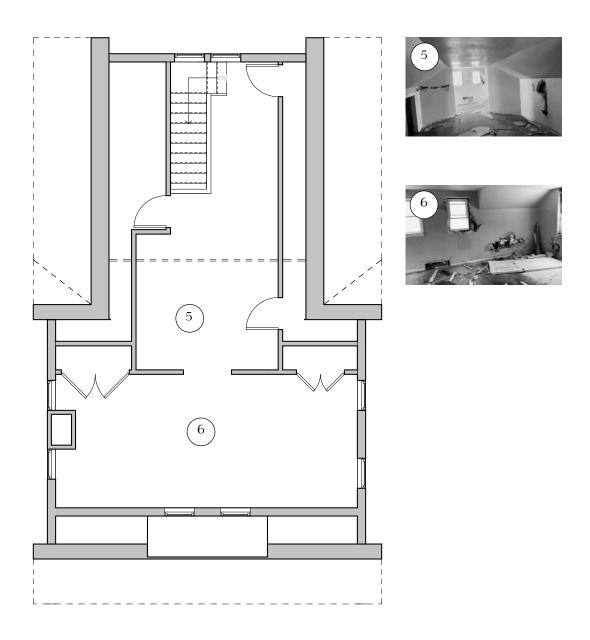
Existing Second Floor Plan, scale 1/8"=1'
